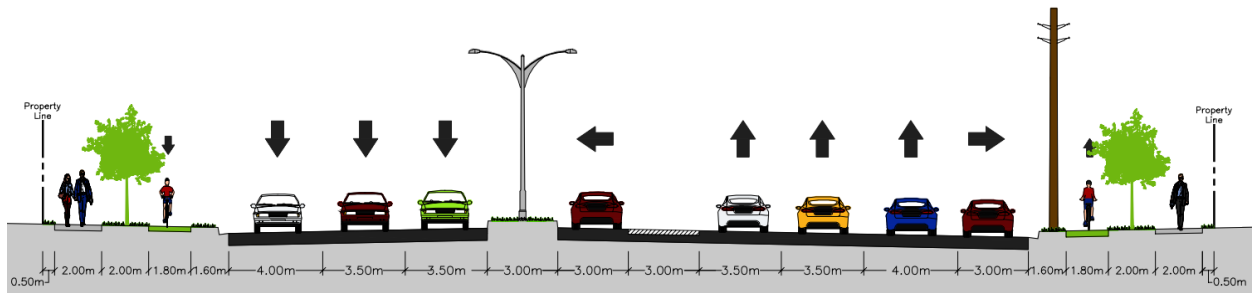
Preferred Fanshawe Park Road Cross-Section, West of Richmond Street
